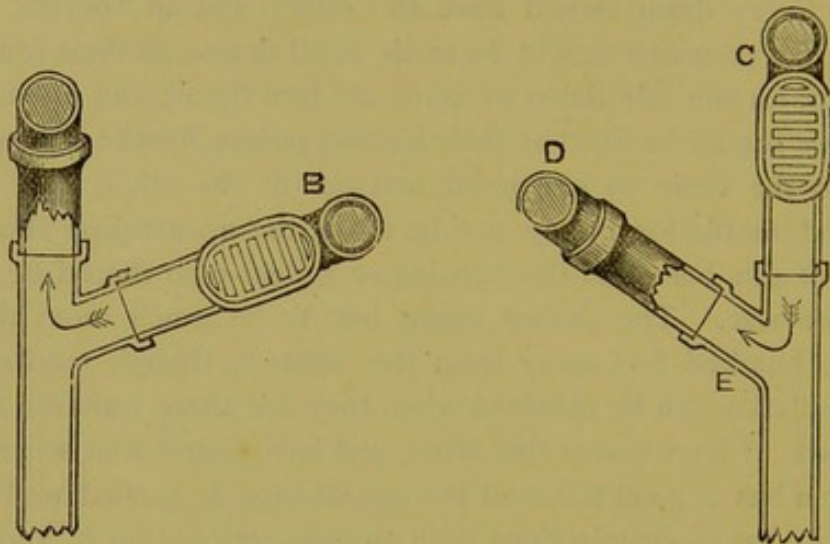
Plan, Error in Connection of Air-pipe with Drain.
